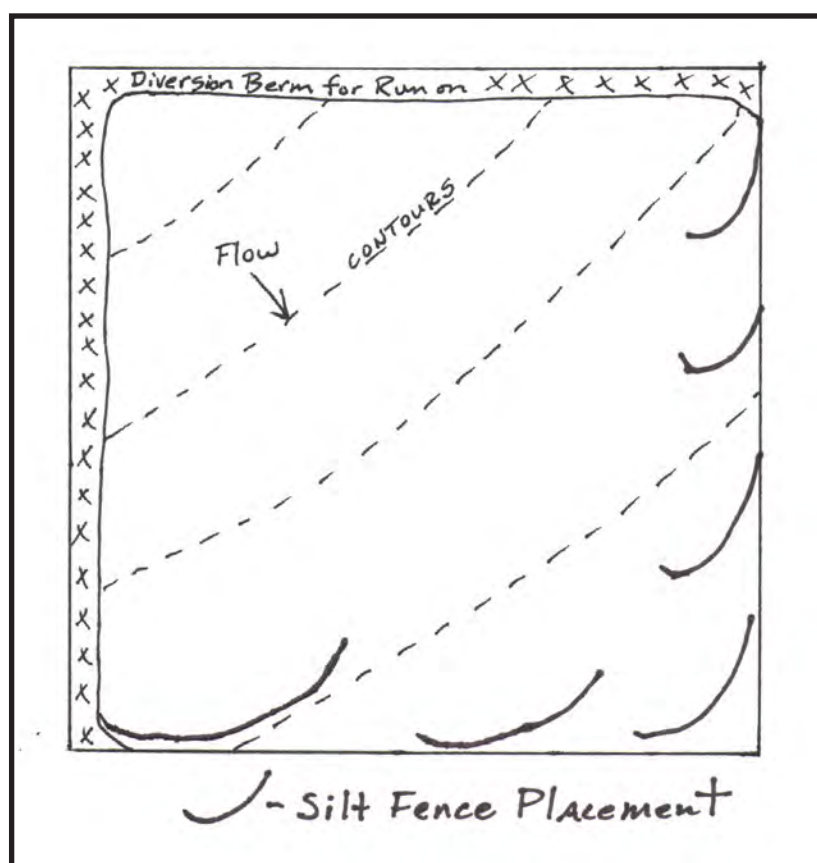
Placement of J-hook silt fence along the perimeter of a construction site to slow and pond small areas of stormwater runoff.
